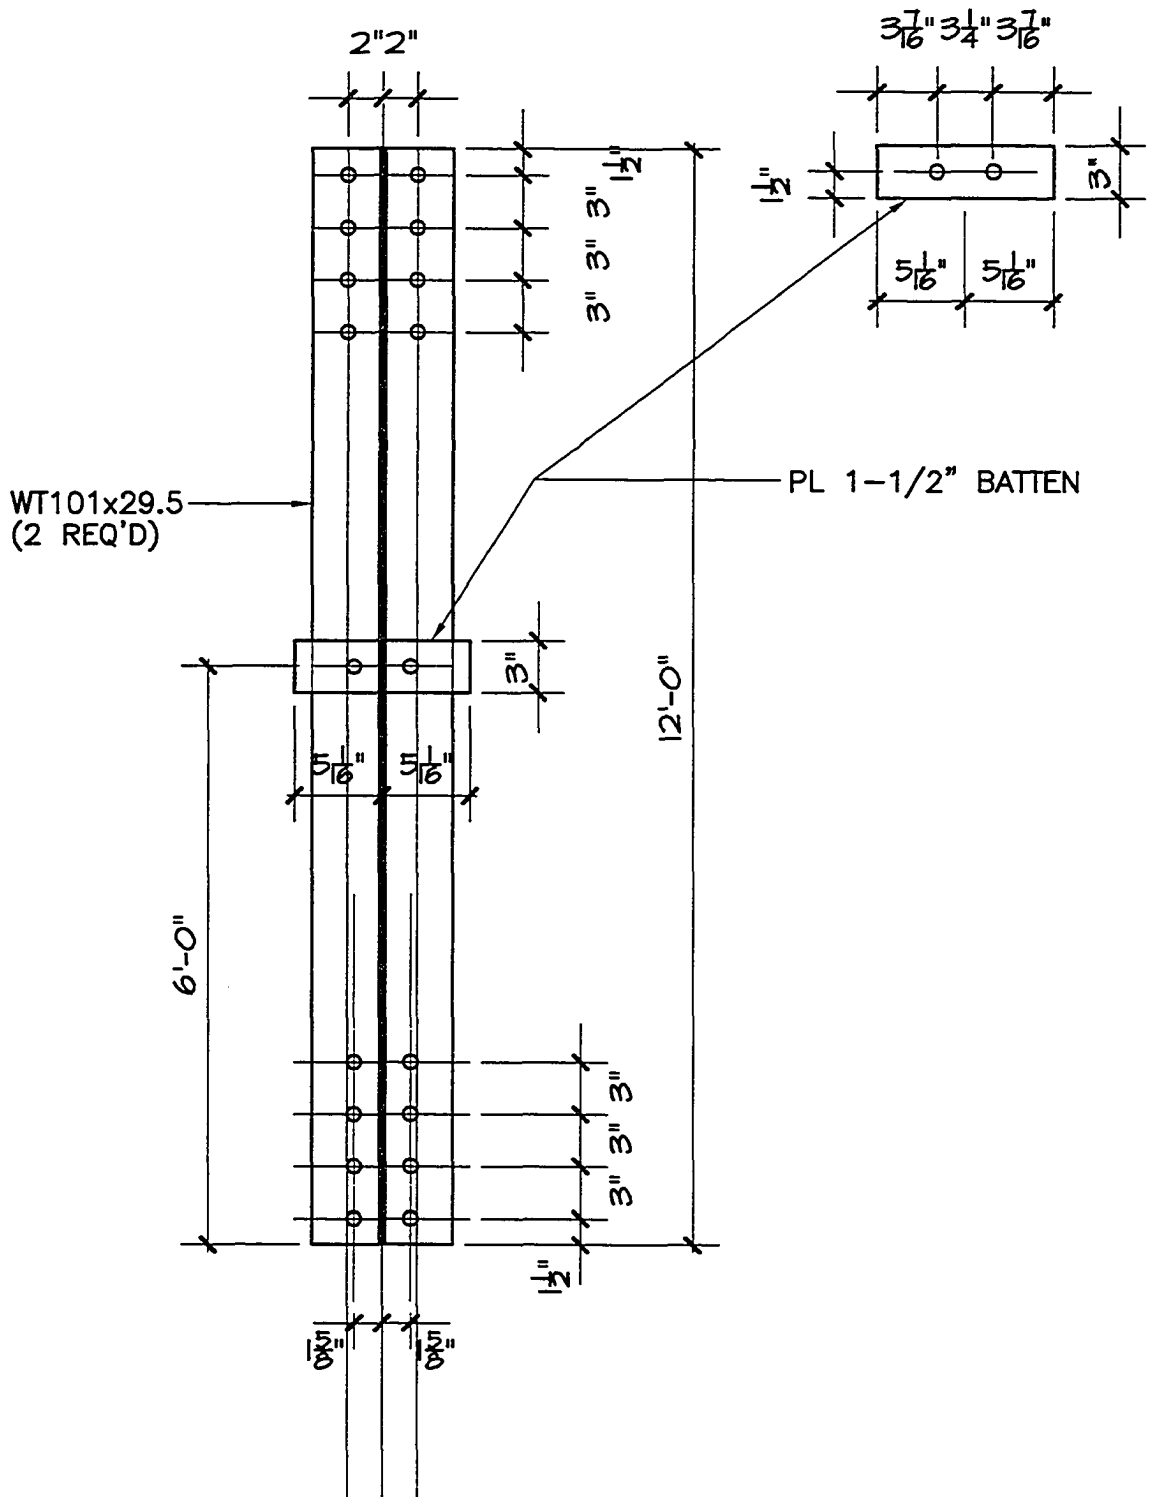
Brace Dimensions (As Originally Fabricated)
